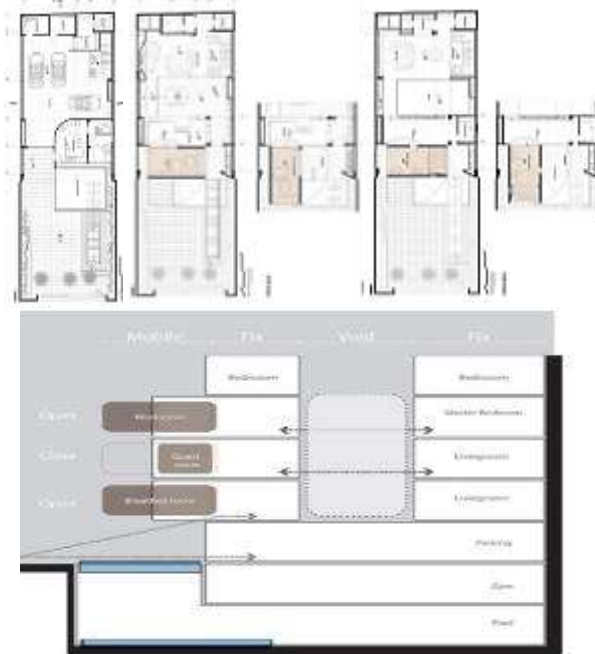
”: Ground (room and a garage) , first & second floor plans components - Building section consists of seven floors and has a central vacuum.
